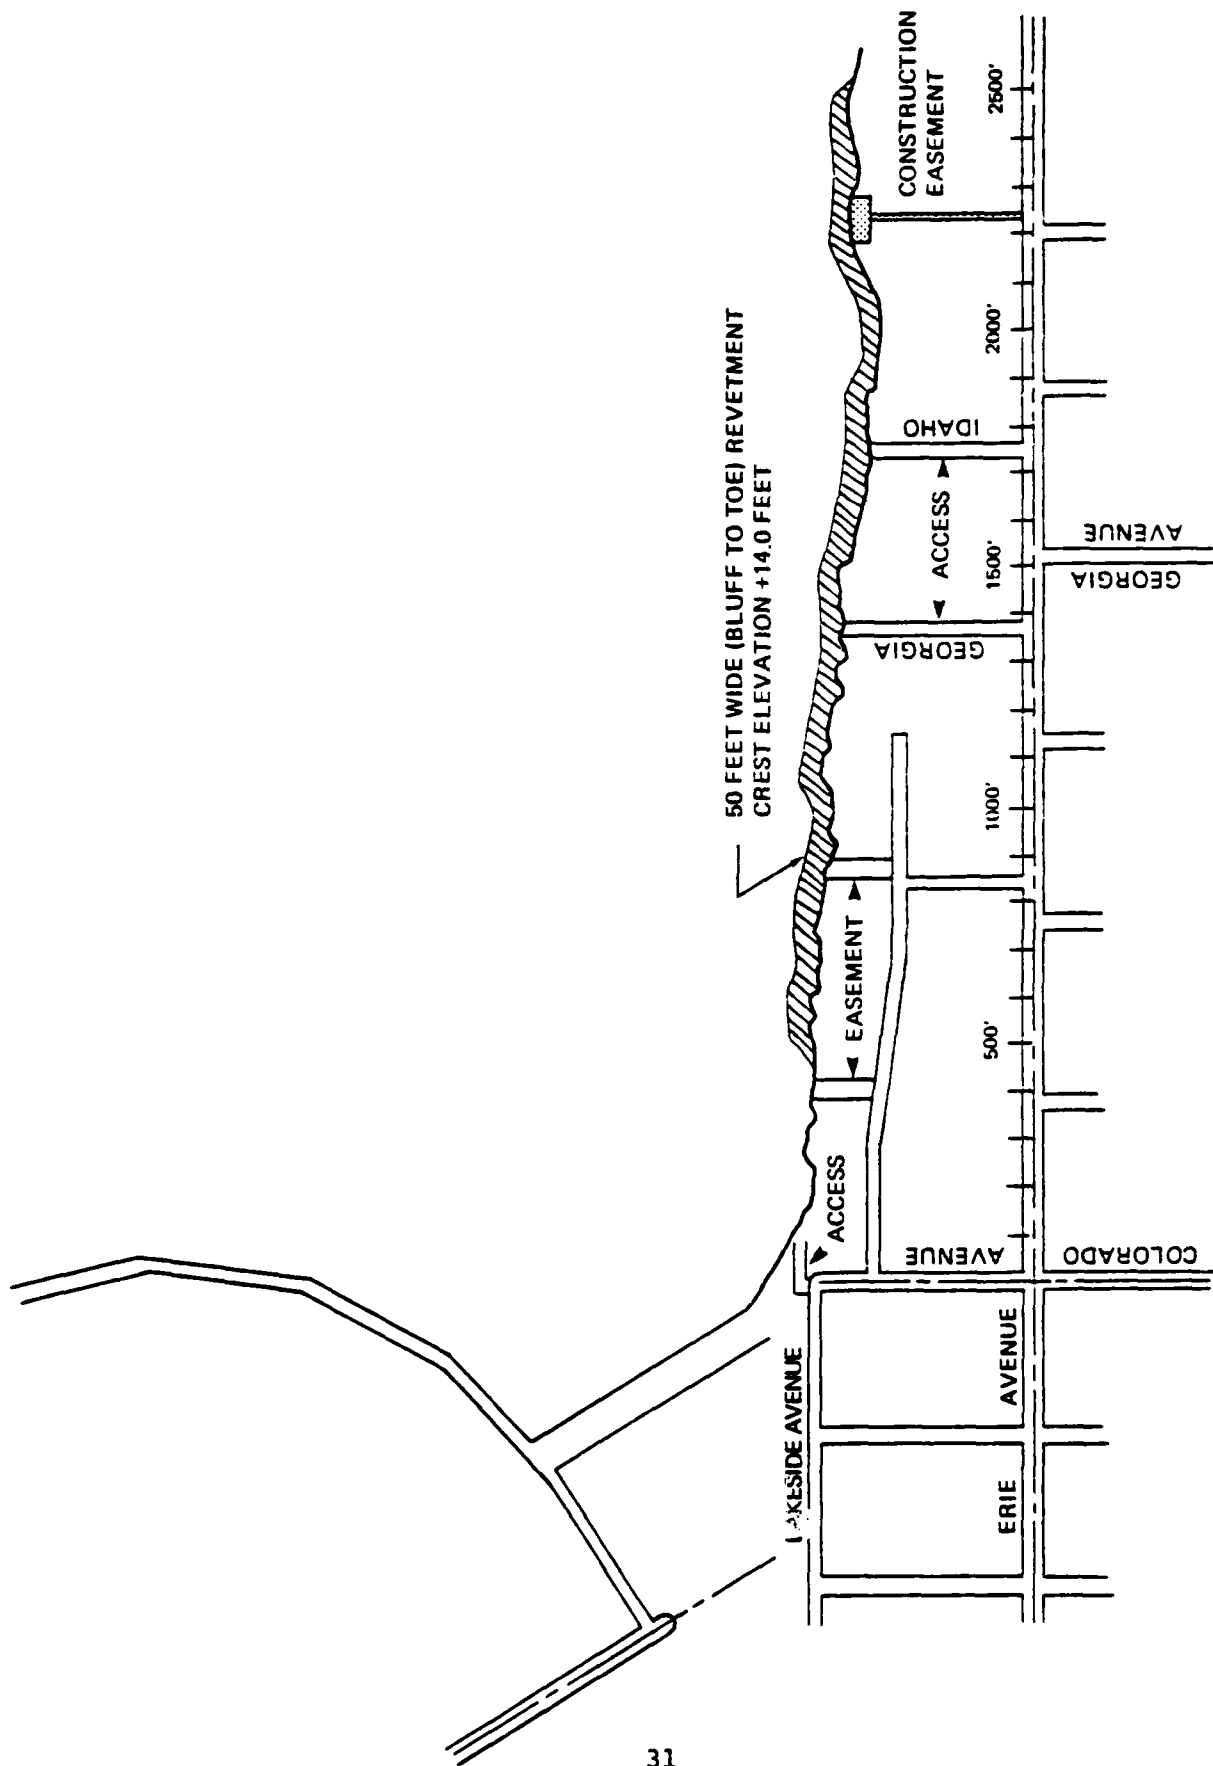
ALTERNATIVE V REVETMENT PLAN
